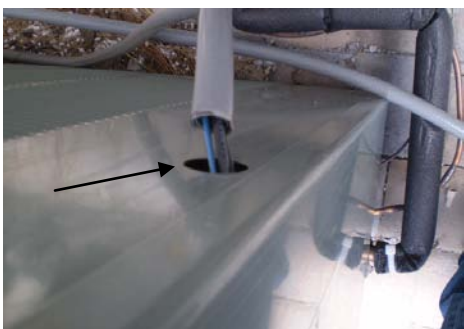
CONDUITS NOT SECURED TO BOTH AC UNITS
